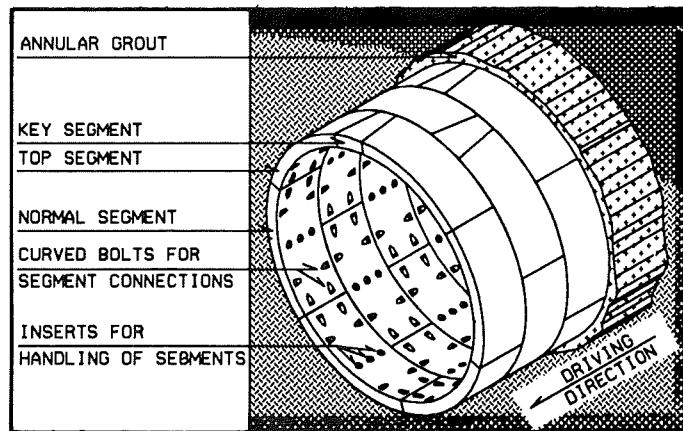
Precast Segmental Concrete Lining with Epoxy Coated Fully Welded Reinforcement Cages.
